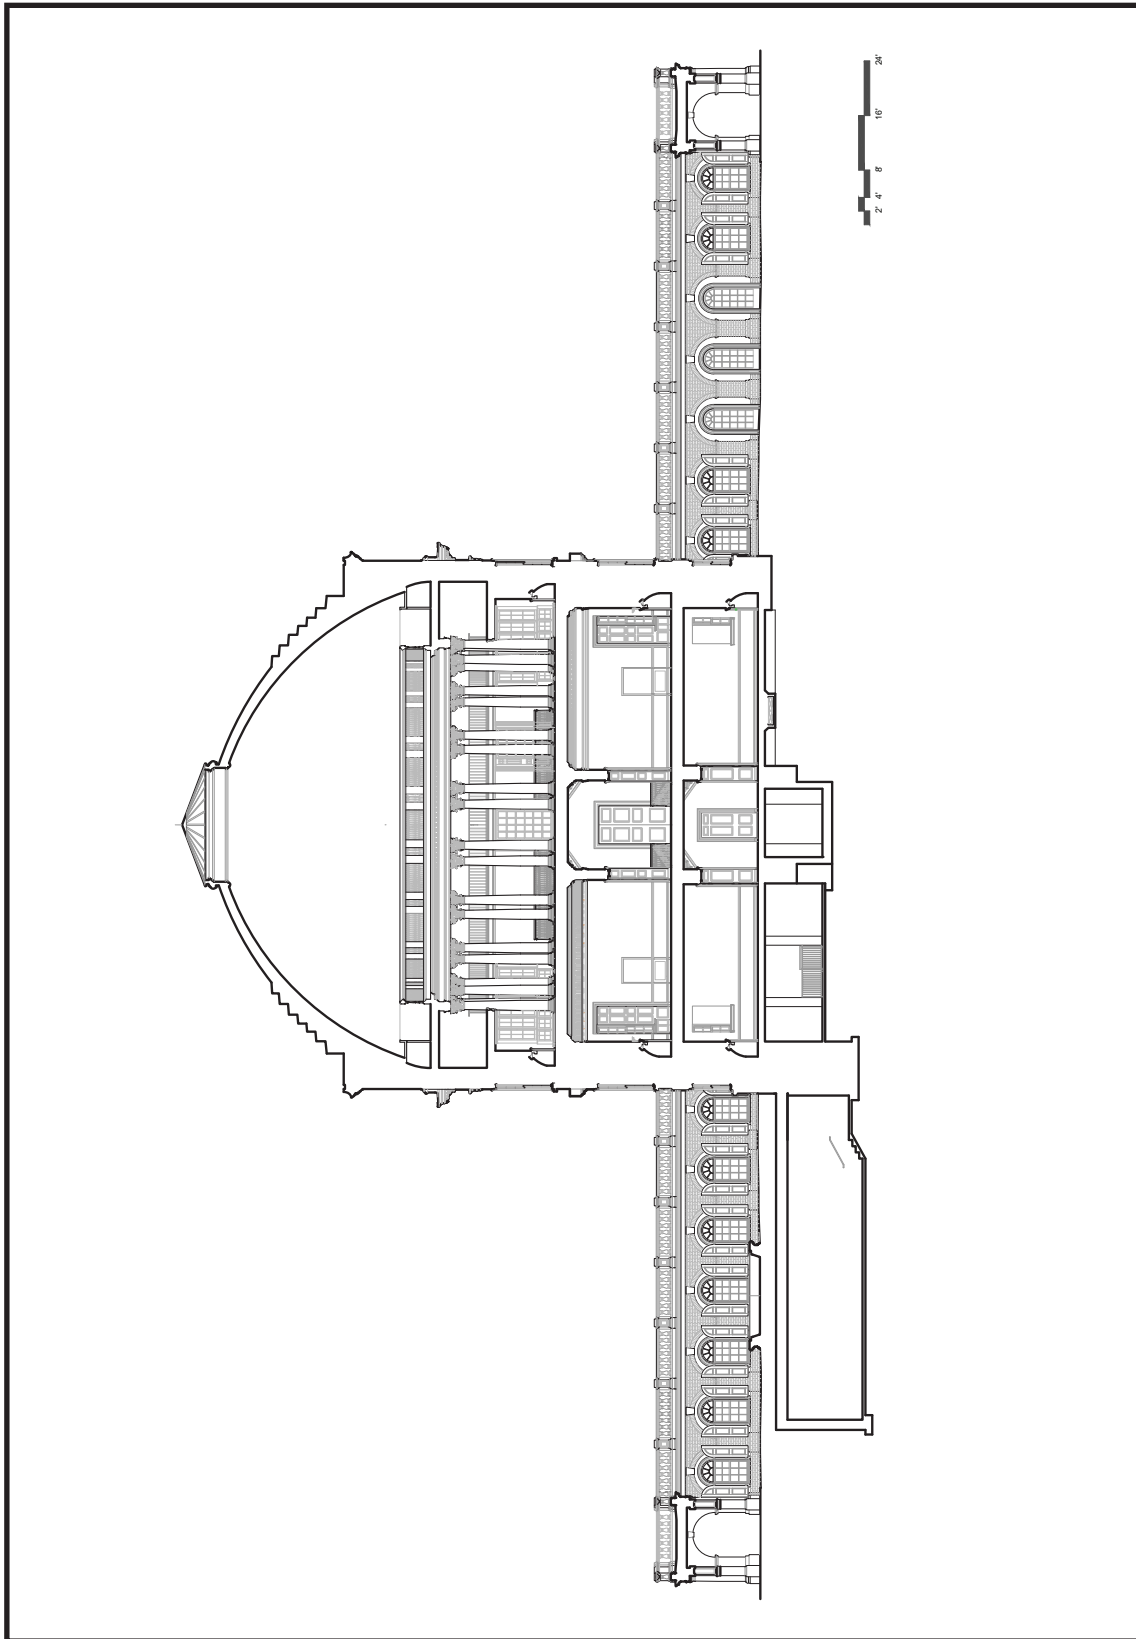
Transverse section, looking south. Drawing by John G. Waite Associates, Architects, 2022.
